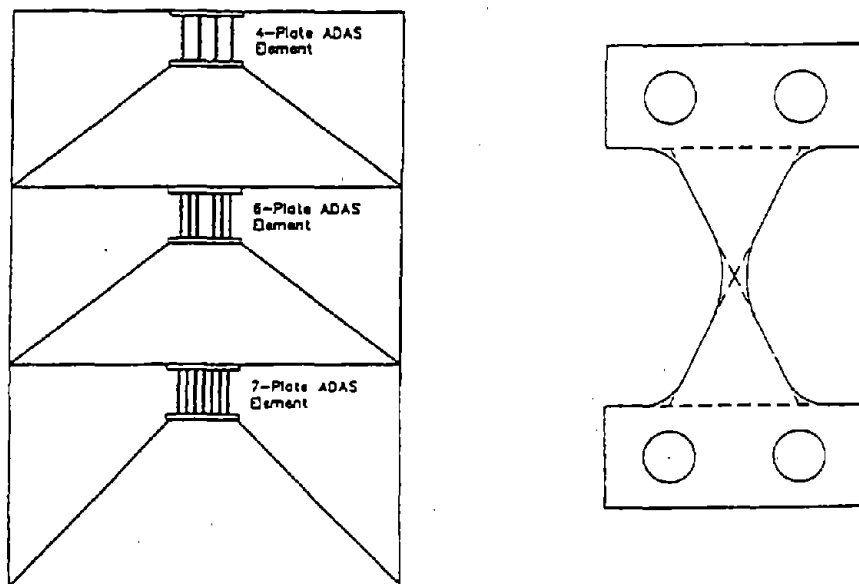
ADAS elements and installation (after Whittaker et al., 1991)
